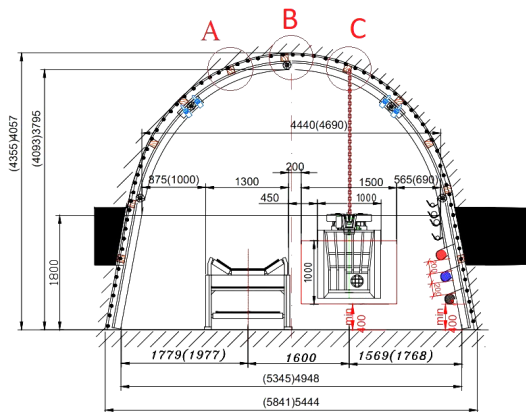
Schemes of possible SMR structure anchoring within the in-seam areal mine workings:
